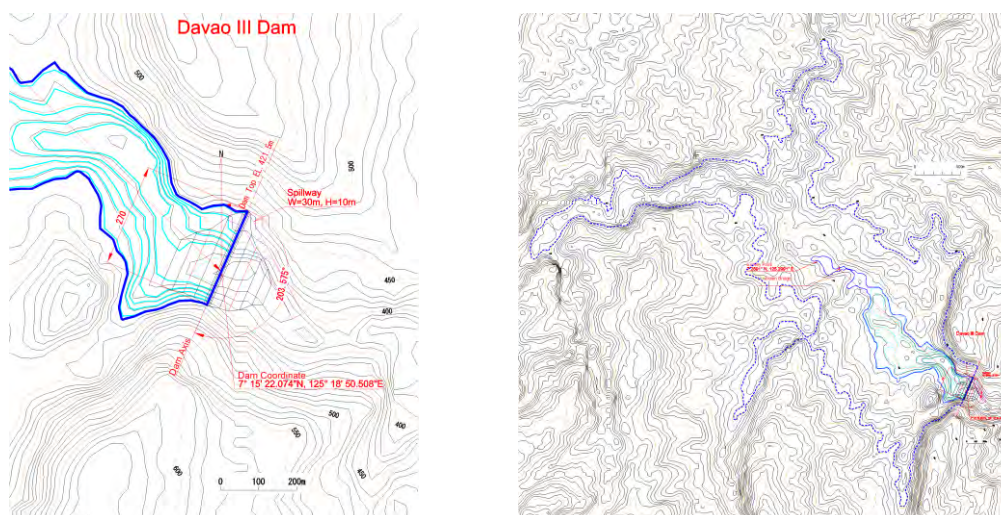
Layout Plan (Davao-III Dam (High) and Reservoir)
